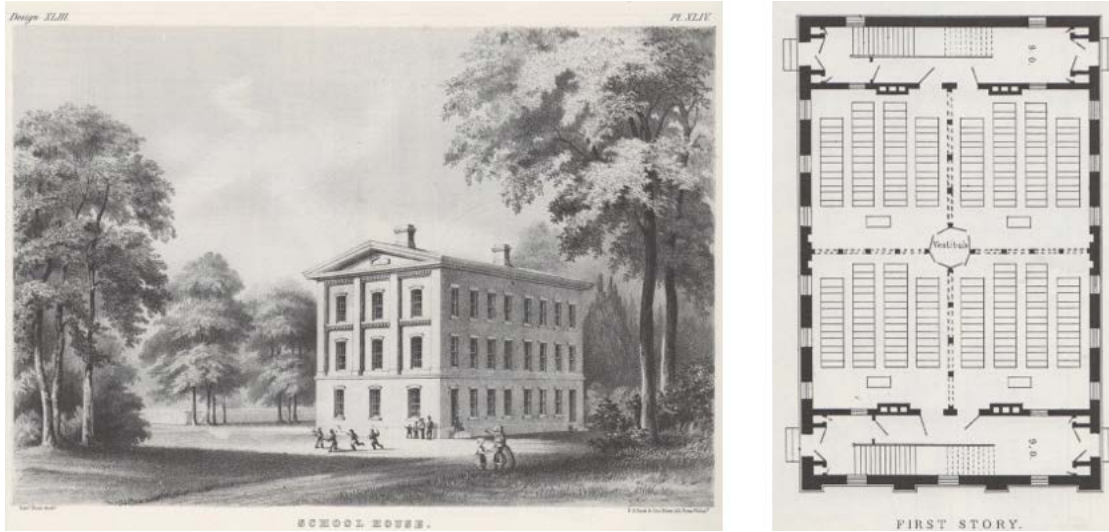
A rendering and floor plan of a “Philadelphia Plan” schoolhouse by Samuel Sloan, from “A School-House,” *The Model Architect*, vol. 2, 1853.
